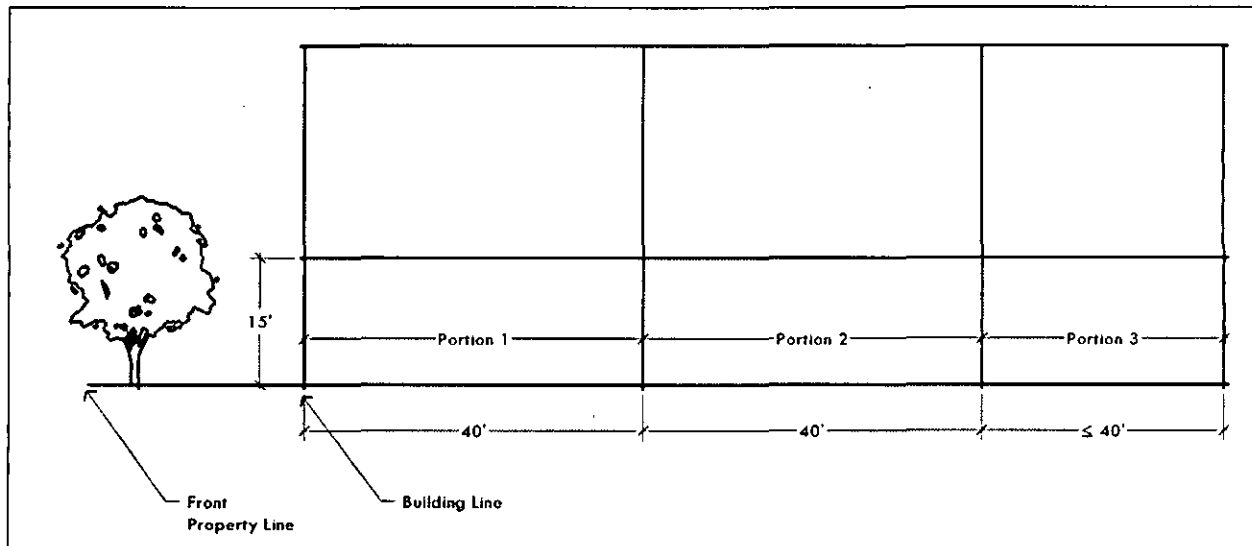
(Elevation View) Dividing Lot into 40-foot Portions to Create Side Setback Planes (Rear Setback Plane Not Shown)
